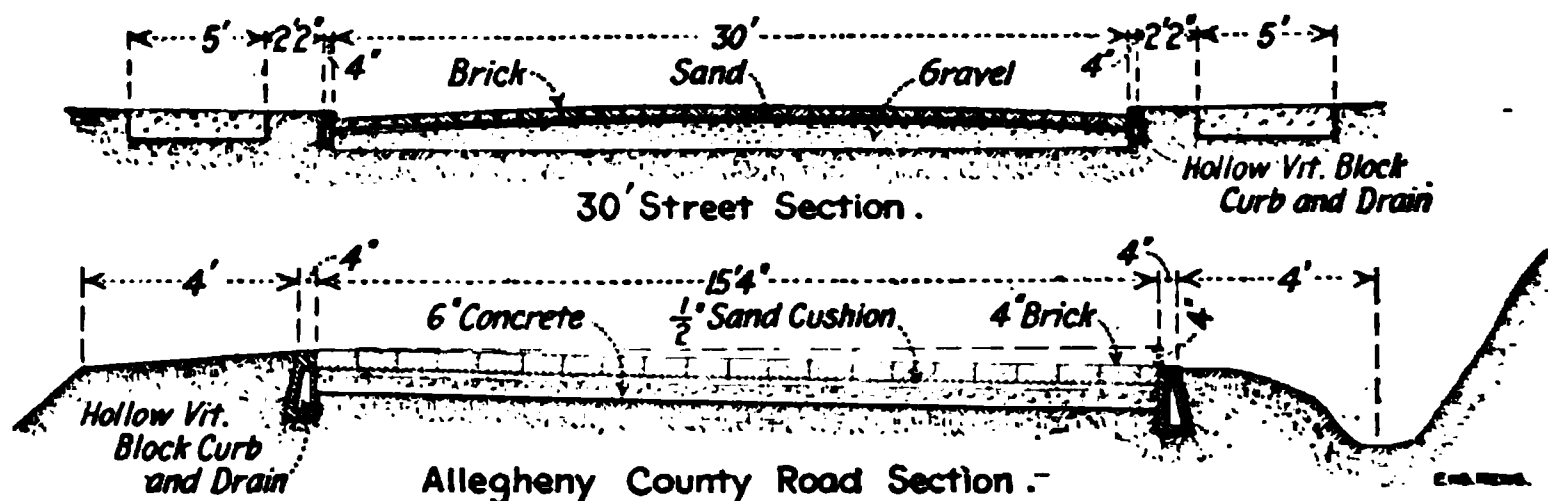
Brick-paved Street and Highway with Vitrified Clay Curbing.
